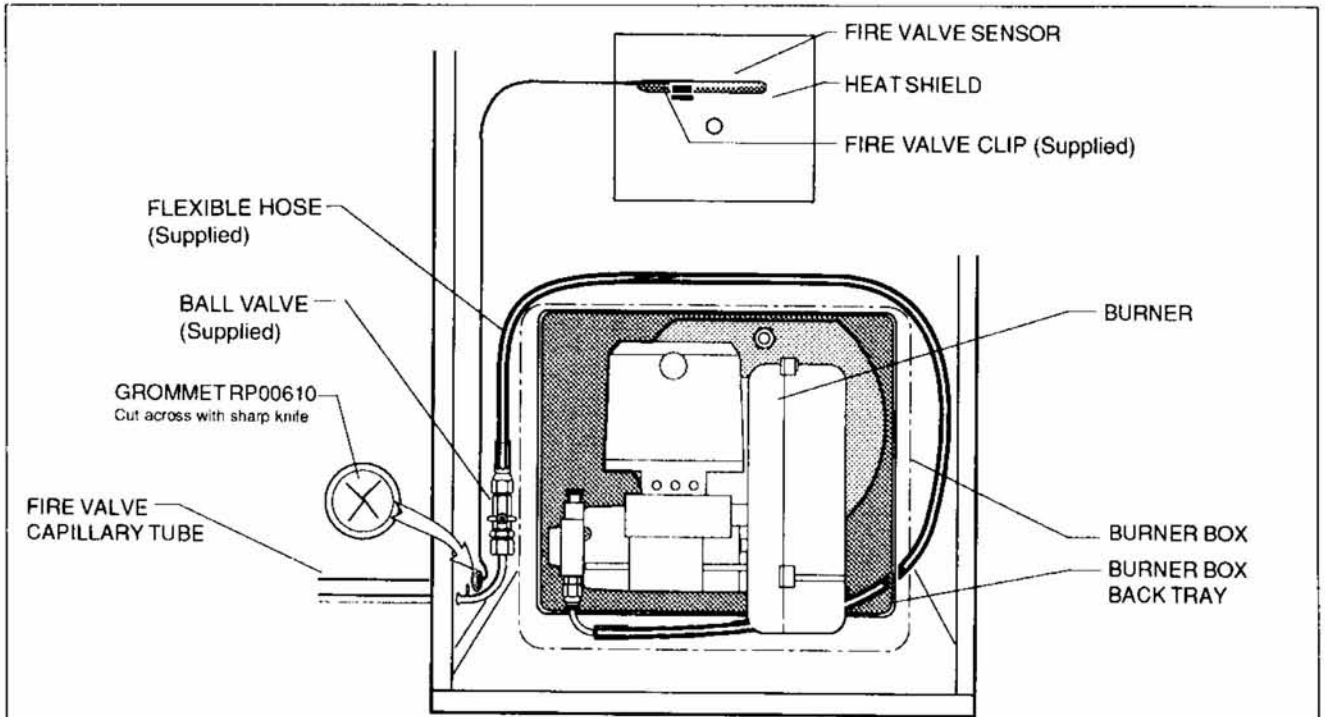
8a Flexible Oil Pipes and Fire Check Valve
